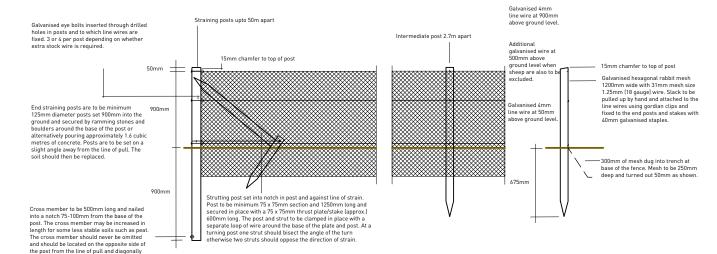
Typical Rabbit Proof Fencing Detail (Not to Scale)
